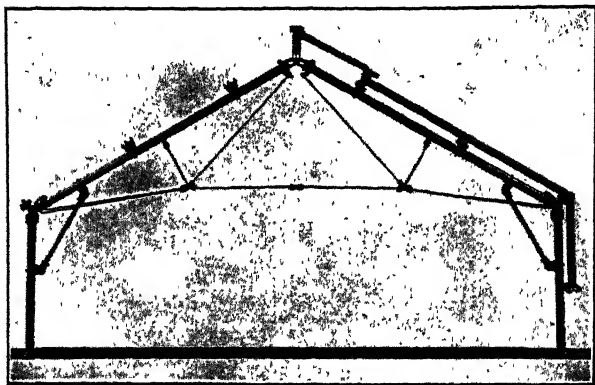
Section of truss-frame greenhouse. The frame is made of gaspipe.
